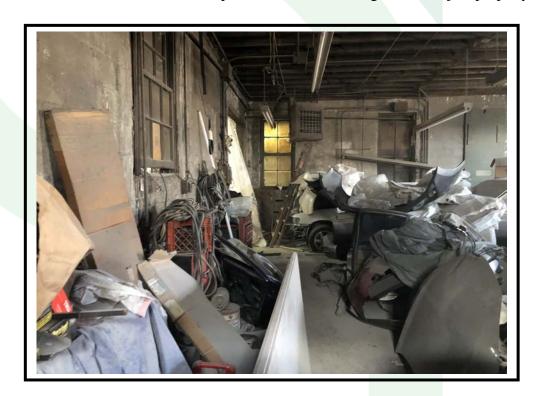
PHOTO LOCATION: Depicts stained floor condition (paint storage section) within the building.
